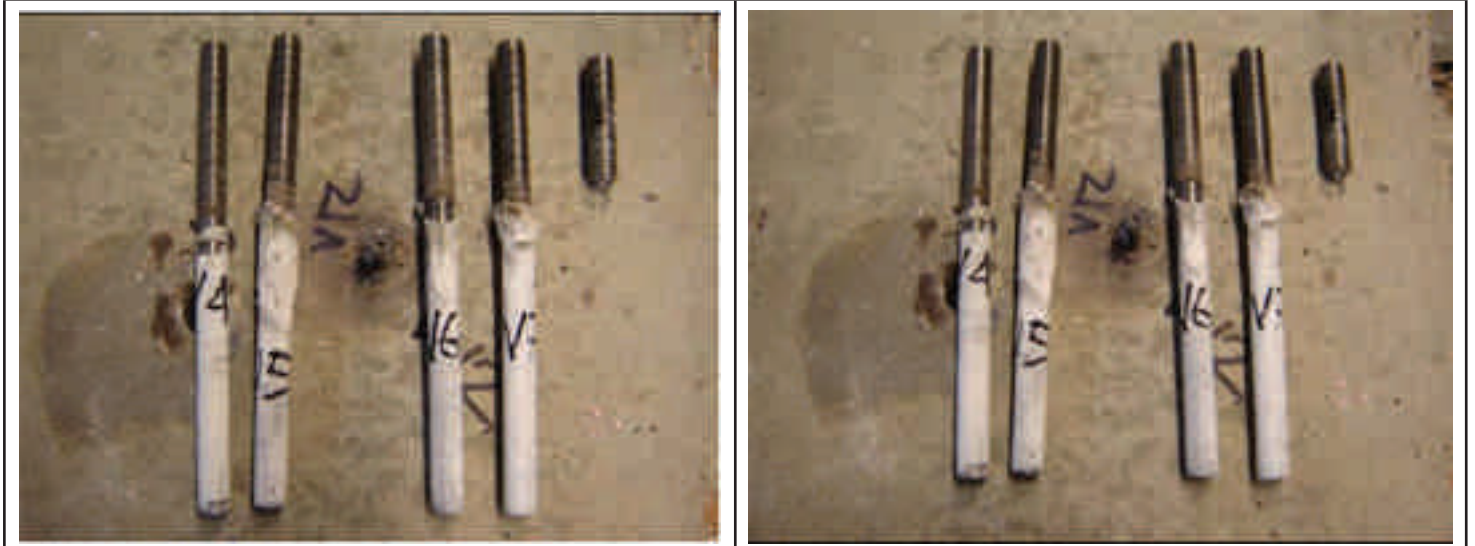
Pull-out failure of Test No. VF12-A1 after tensile loading in dry cleaned holes
